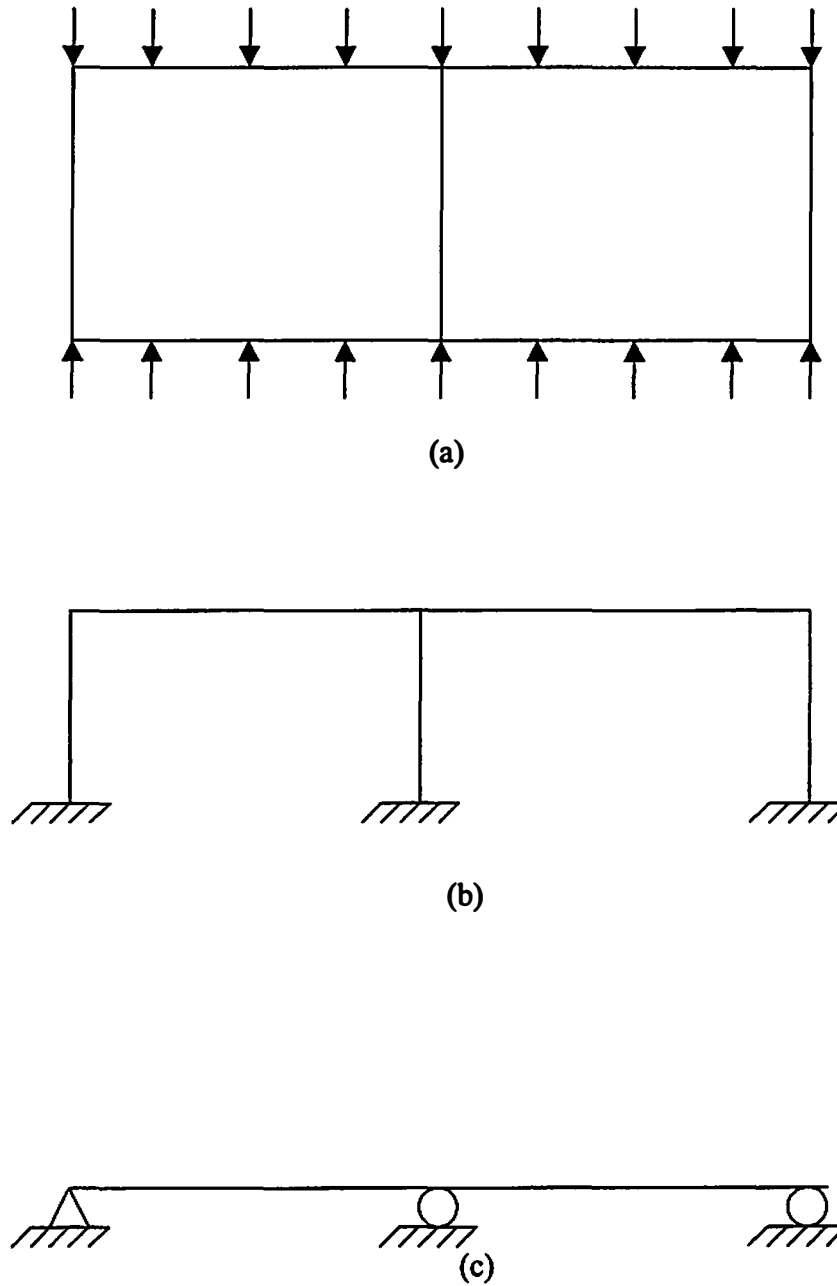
Boundary Conditions for Roof Forces. (a) Bottom Support Assumed to Provide Uniform Pressure. (b) Bottom Support Assumed to be a Stiff Support. (c) Culvert Roof Assumed to Be a Continuous Beam.
